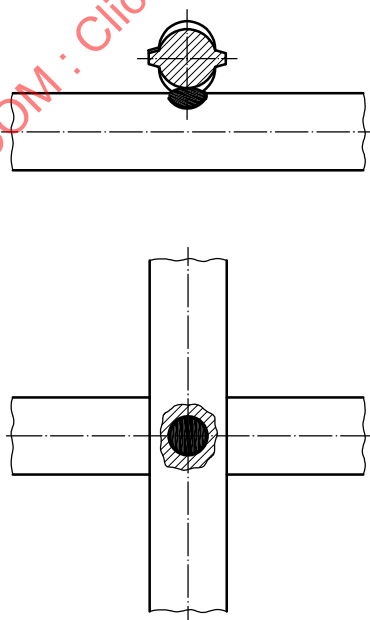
Cross joint welded by welding processes 21 and 23
